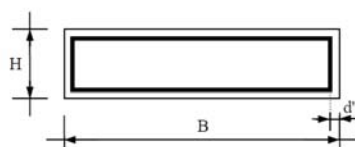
Distribution of the steel reinforcement in the cross-section of the column.
